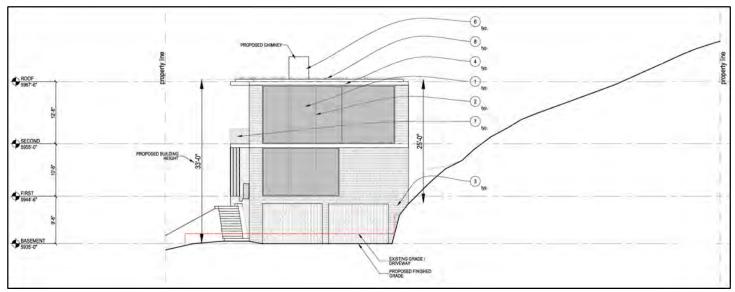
Existing and Proposed Driveway Grade (Sheet A201)
